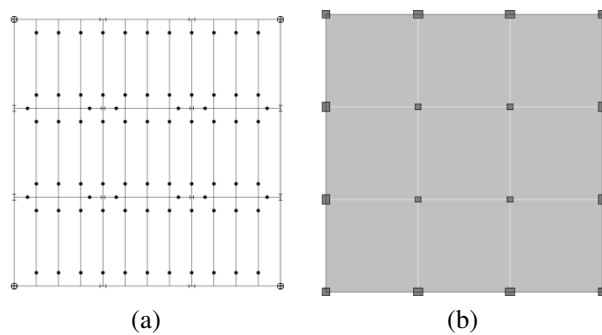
Plan view of the designed buildings for (a) steel buildings (steel frames with composite slabs) (b) concrete buildings (concrete frames with concrete slabs)
